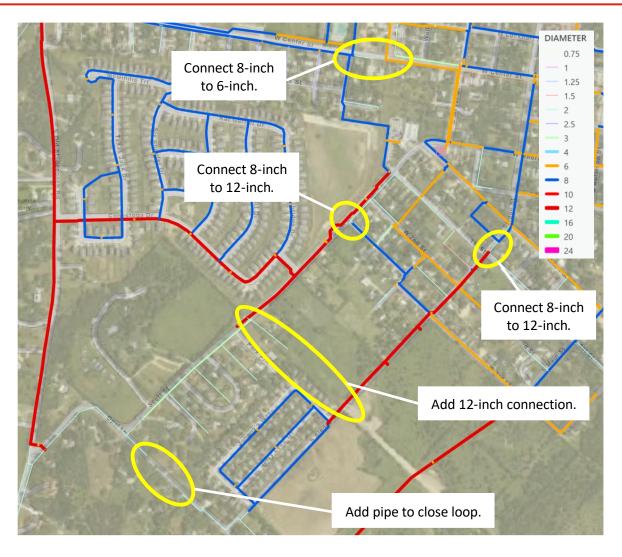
Recommended New Connections within Modified Pressure Plane 2
